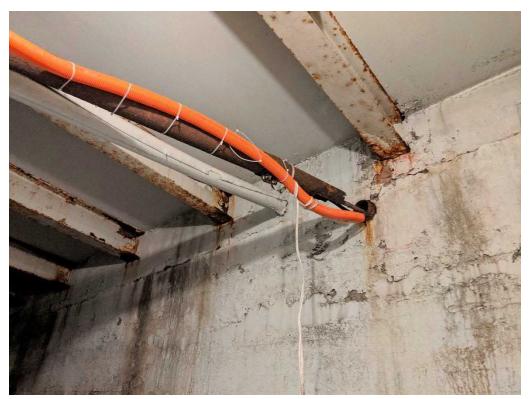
Utility Penetrations through North Foundation Wall near Vault Center.
